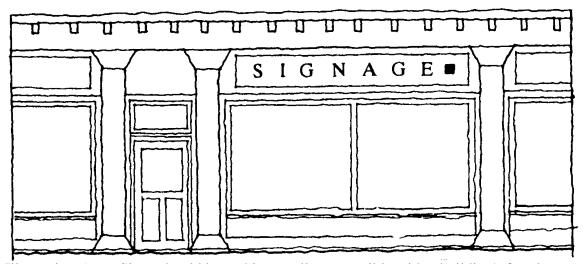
Signs should be architecturally compatible with a building's facade.
